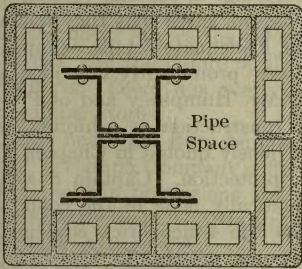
Column Protection, Union Trust Building, Baltimore Fire.
